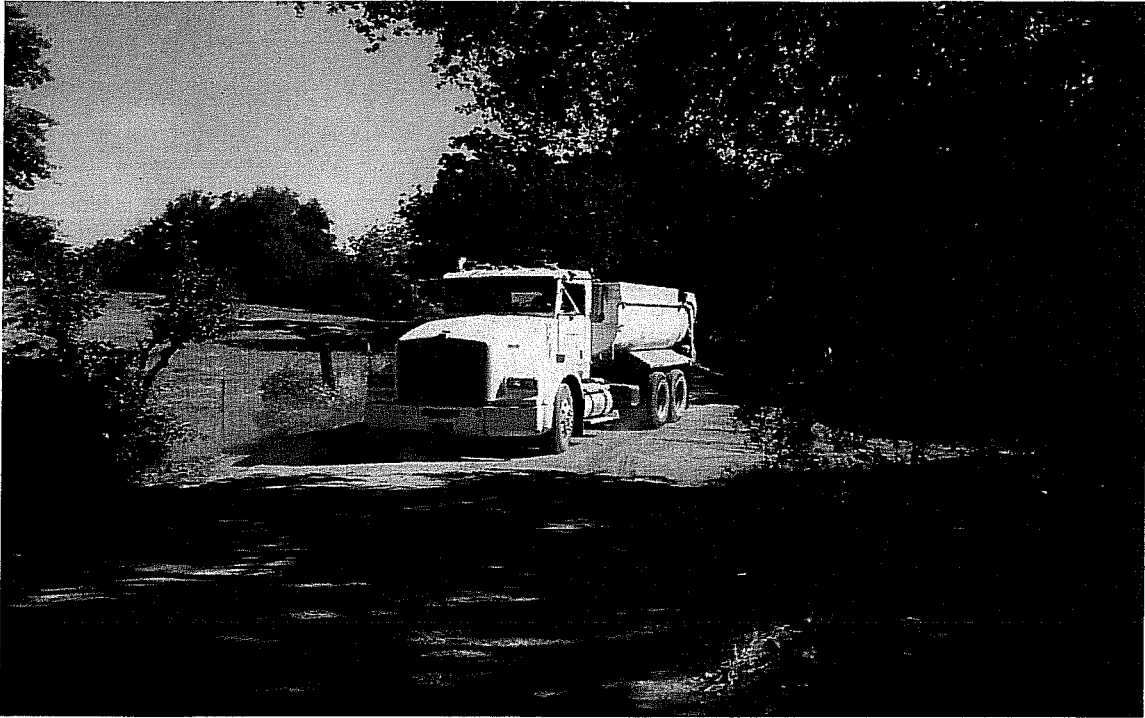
Dump truck exiting project site. Soil was obtained from cemetery across the street.
